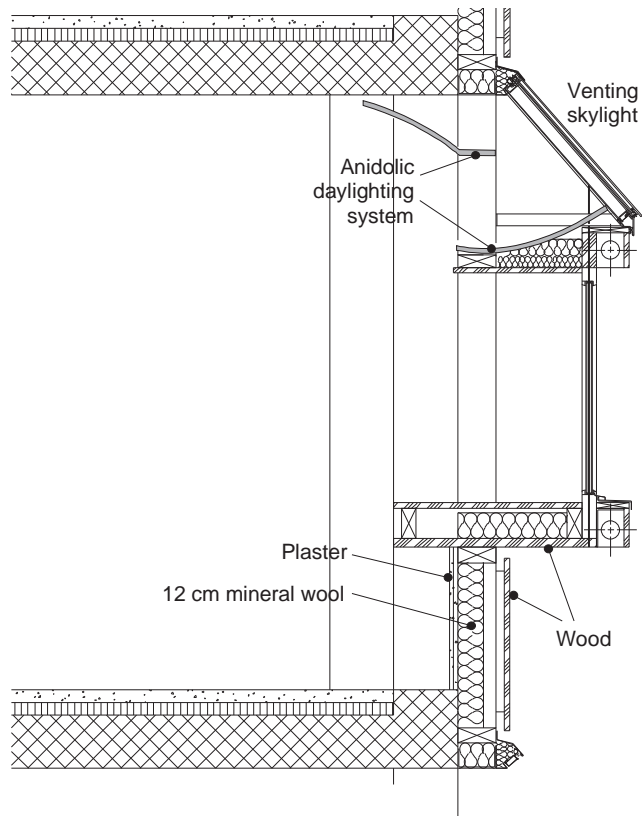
Vertical section detail of an office room located in the South façade of LESO building which showcases the conventional window on the lower part and the ADS on the upper one [32].
